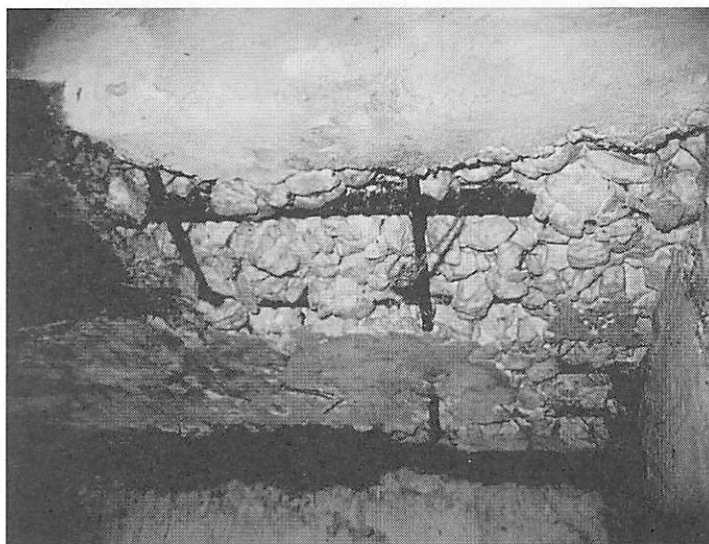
Longitudinal reinforcement and stirrups losing too much of cross-sectional area
